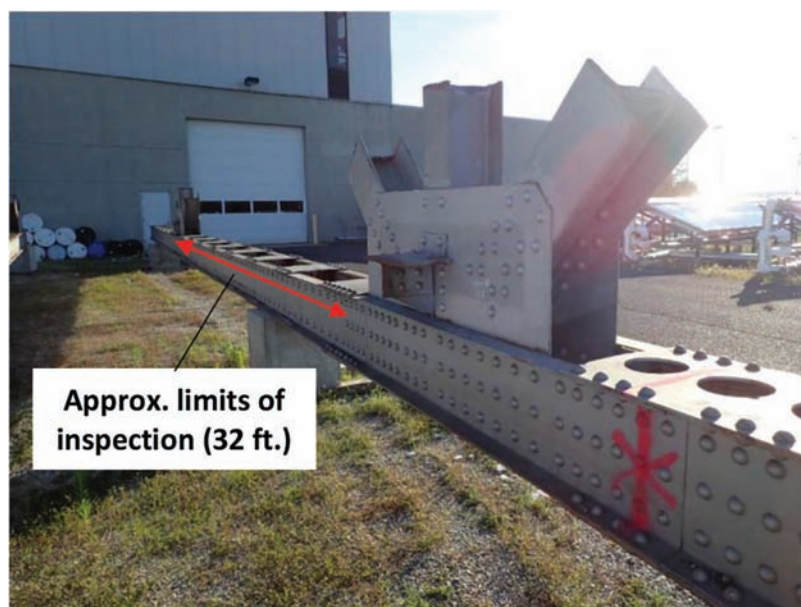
Truss chord elevation view (looking from joint L4 to L2).
